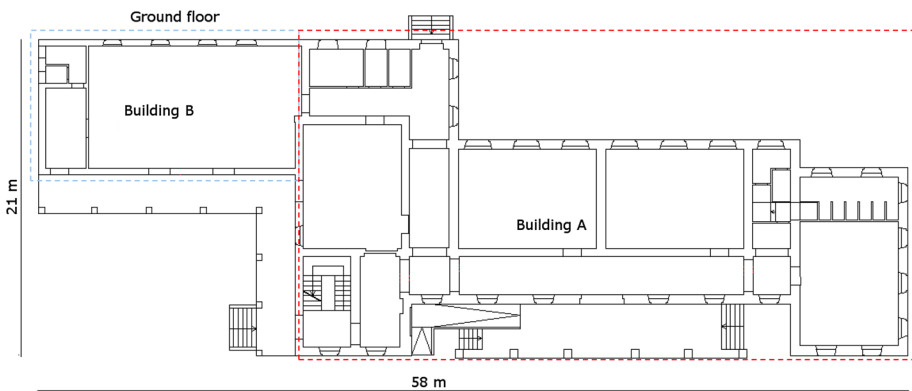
Ground floor plan view of URM building school of Acquasanta Terme: school building, Building A (dashed red line box) and laboratory building (Building B)
